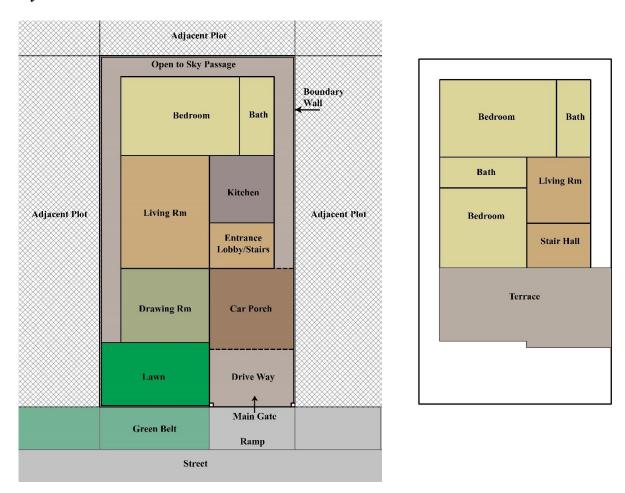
Basic Layout of a Modern House (Left: Ground Floor; Right: First Floor)
